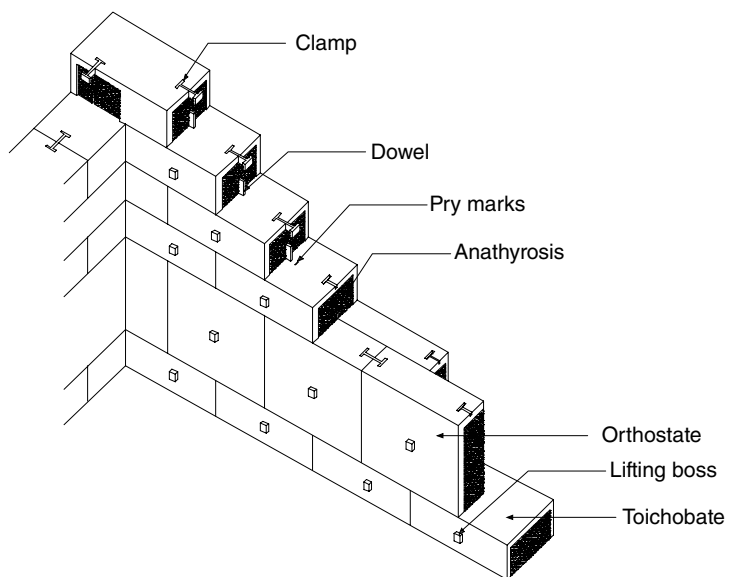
Ashlar wall construction. *Source:* N. Klein.
